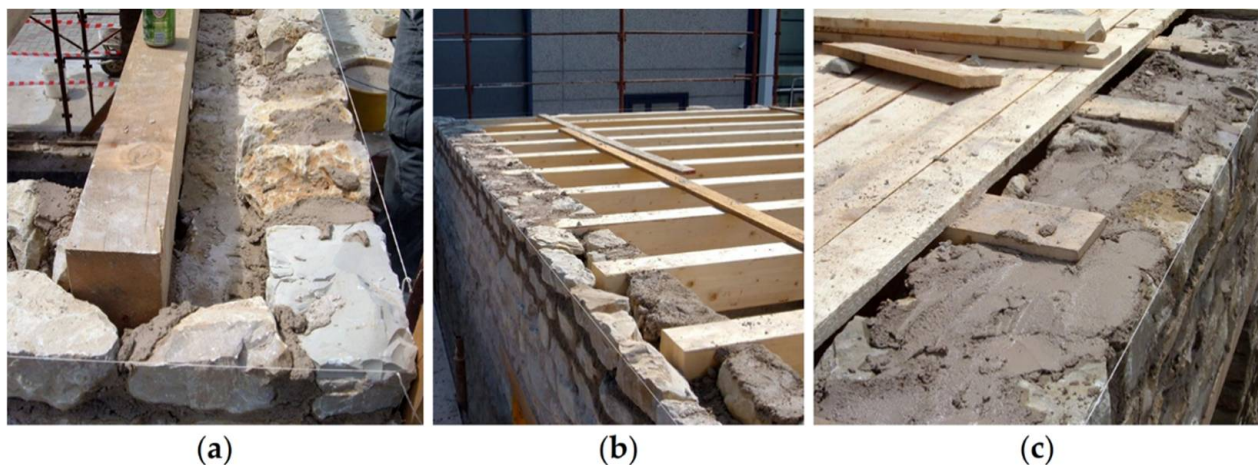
Double-leaf stone masonry: (a) stone interlocking at corners; (b,c) through stones at opening edges.
